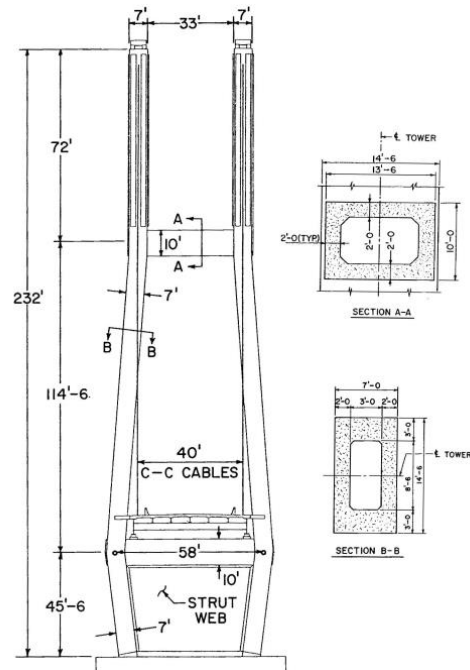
Elevation and cross-section of the tower (Wilson and Gravelle, 1991)
